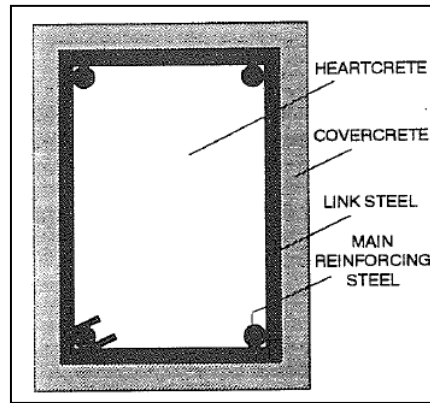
Typical reinforced concrete section with the inner layer – heartcrete – and surface layer – covercrete (Ballim, 1993)
